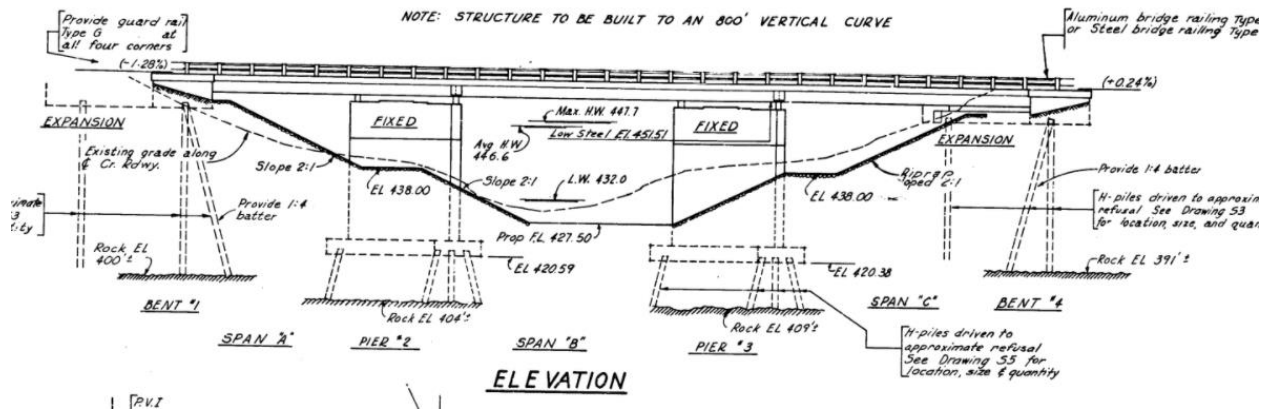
Elevation View of the Bridge (NBI 14840) (1969)
